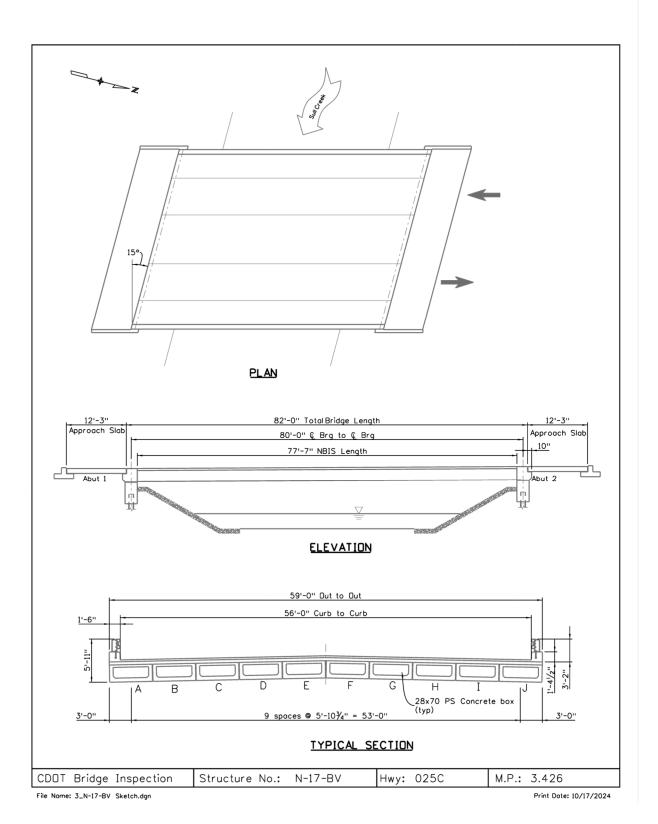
Bridge Inspection Sketch – Example 3
